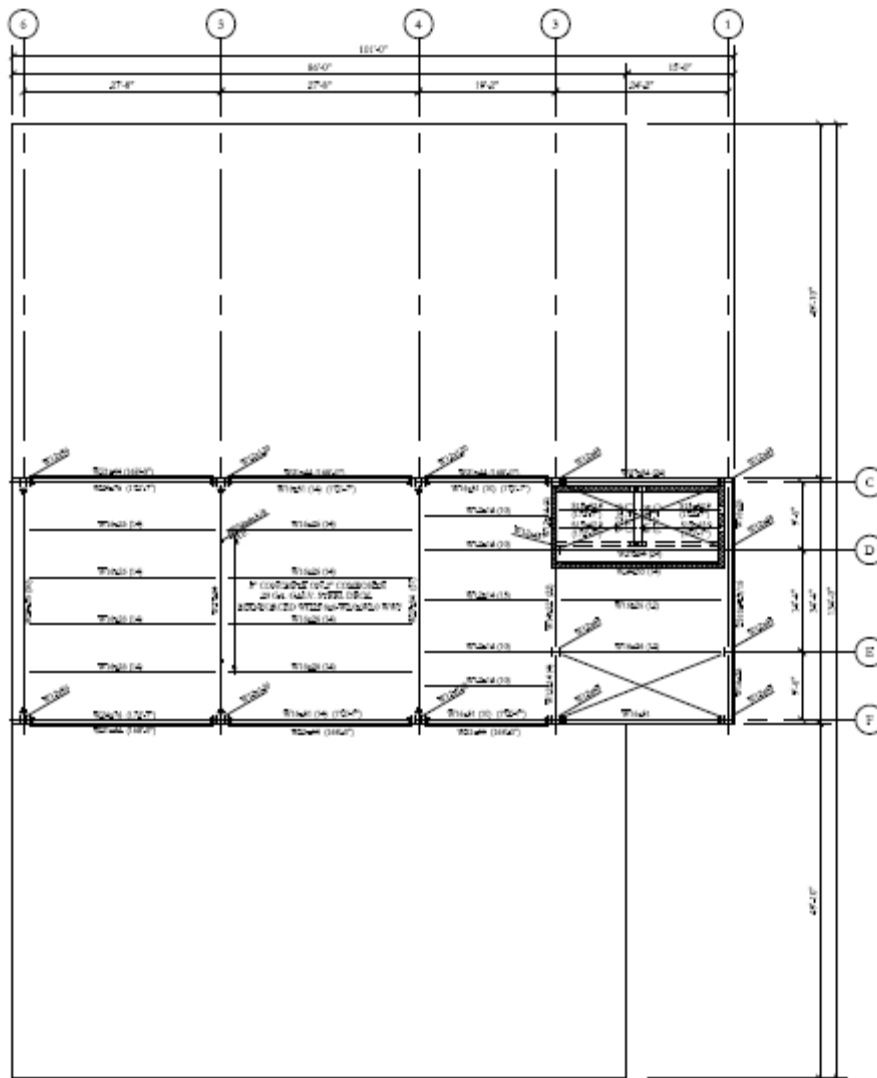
Existing Steel Structural System 6th Floor Framing Plan
